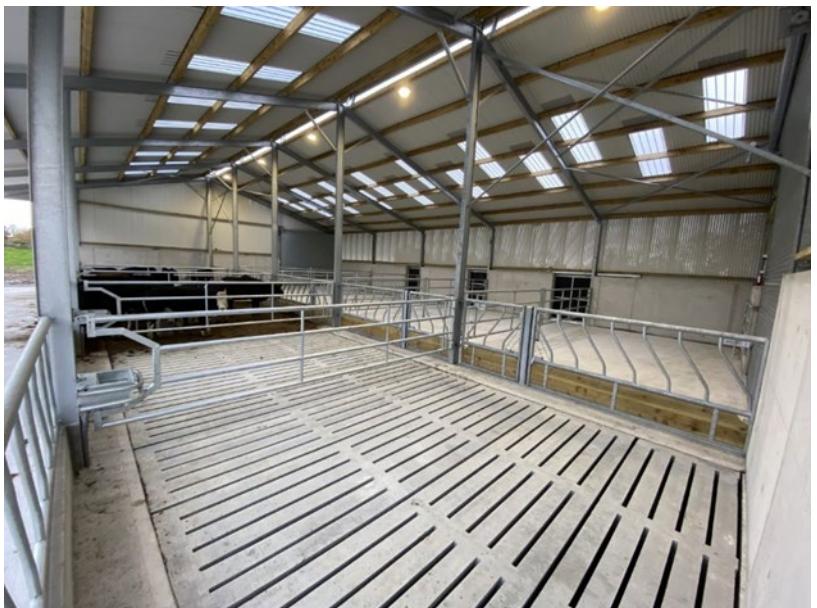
Empty shed with concrete slatted floor (© Agriland, online).
